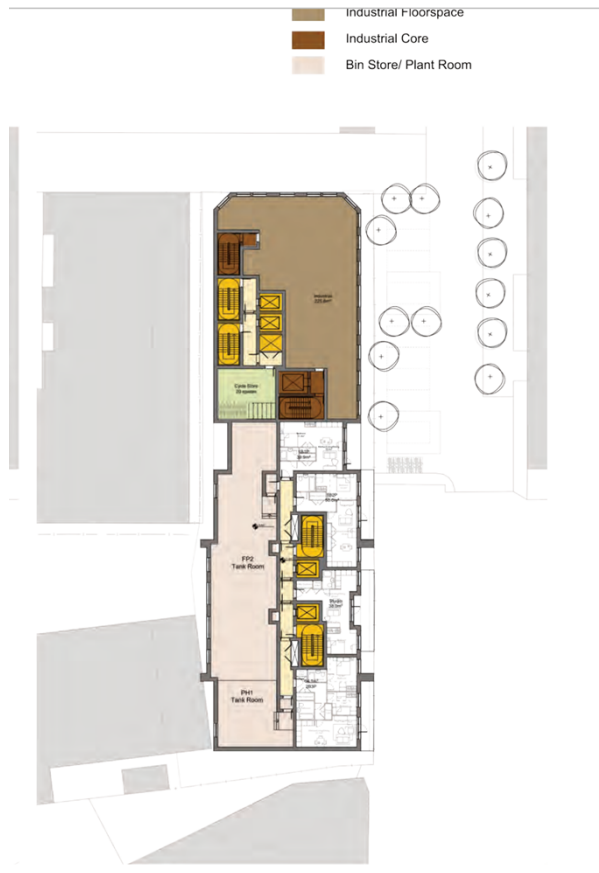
Proposed Ground Floor Showing Industrial Space and Off-street servicing area
